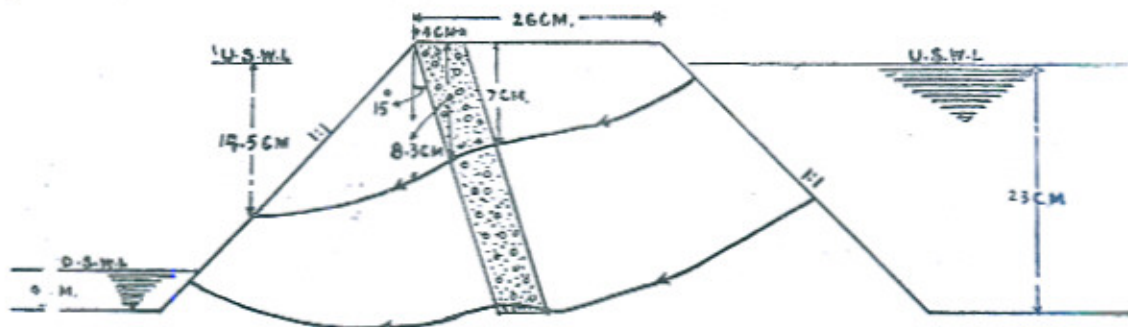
An embankment with a Sind type core wall. At d/s end flow emerges higher than in Fig. 5.
